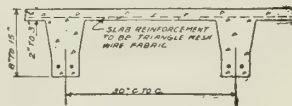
TYPICAL SECTION OF CONCRETE JOIST FLOORS
